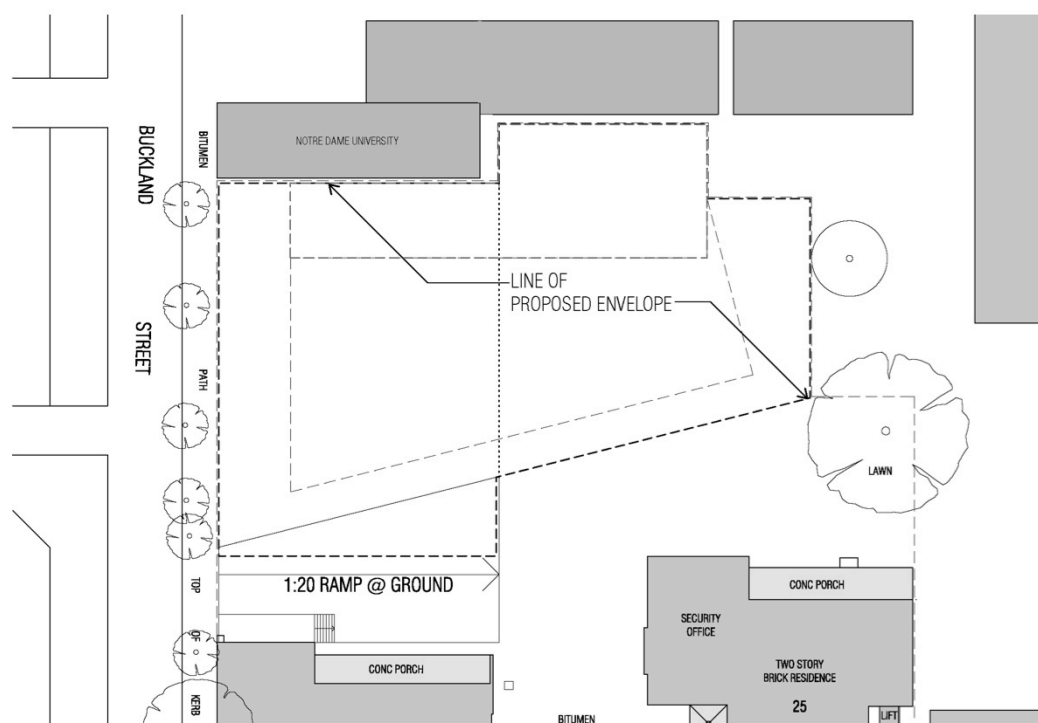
Extract from the architectural plans showing the proposed envelope on the site
